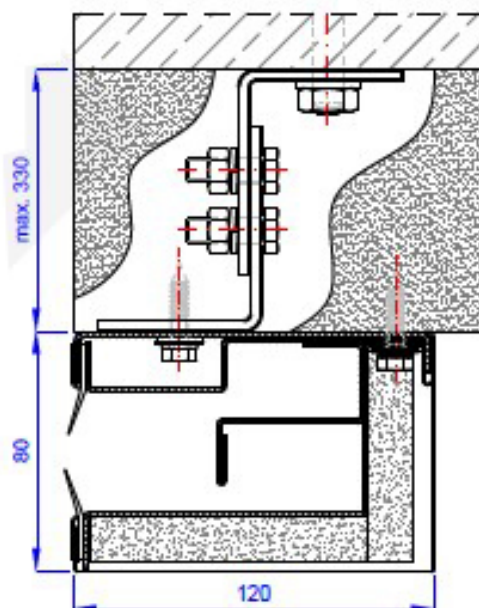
Guides mounted on spacer brackets – intermediate installation
